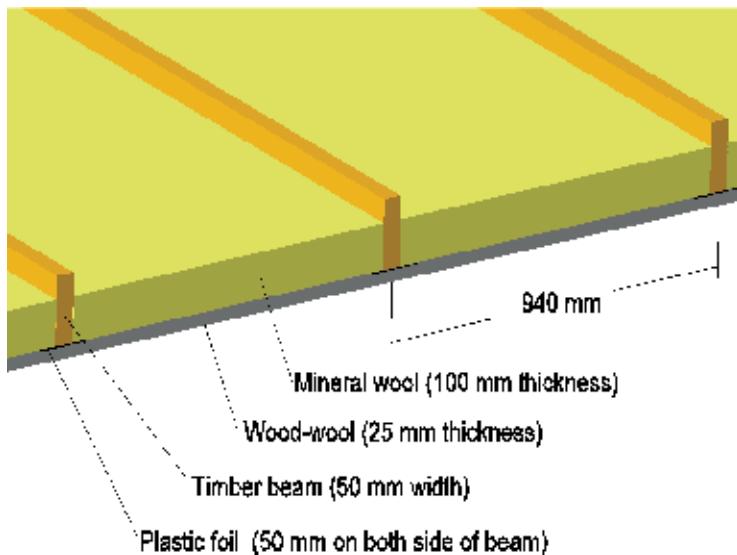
Typical construction for diffuse air inlet through ceiling.
